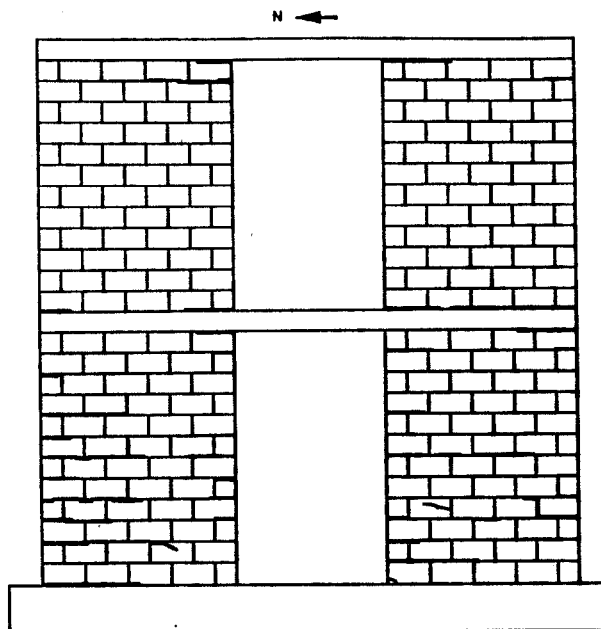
Sp. 2b: Progression of Wall Cracking at Load Point 67
